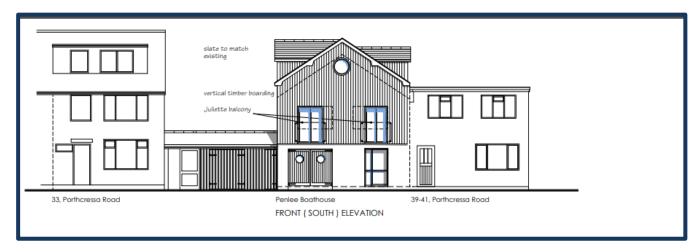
Approved Front Elevation for Penlee Boathouse (Application P/19/06)
